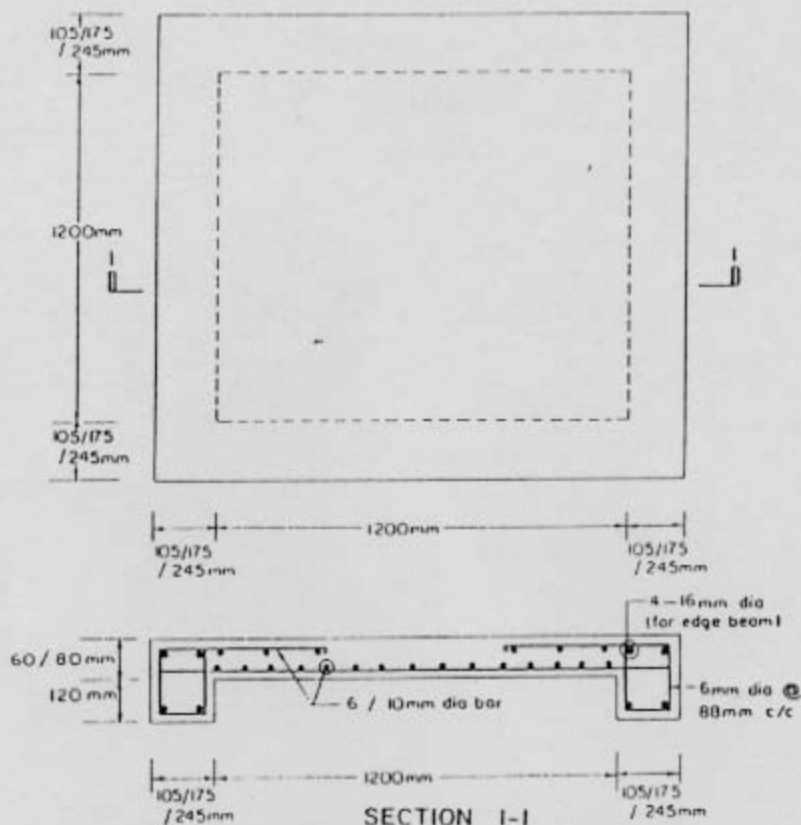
Dimensional, Cross-Sectional and Design Details of RC Slabs Tested
